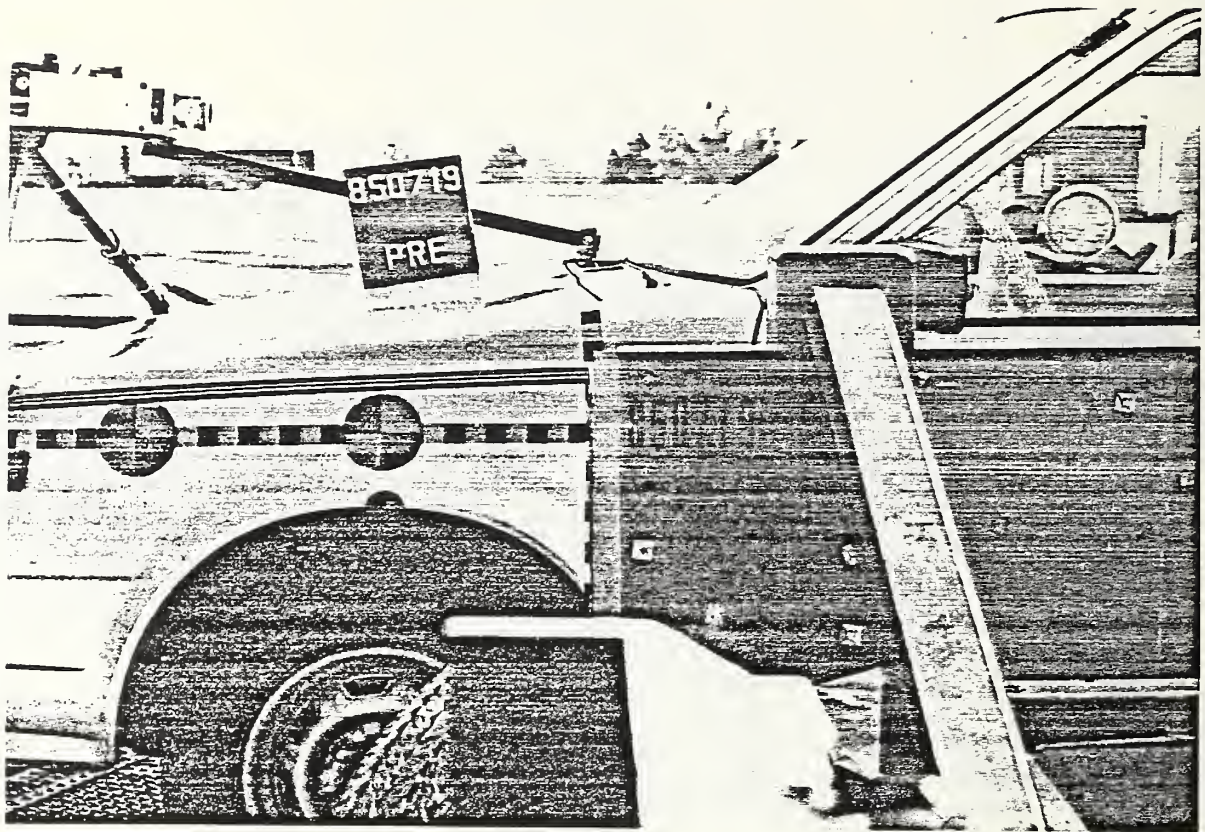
PRE-TEST CLOSEUP - VIEW 1
